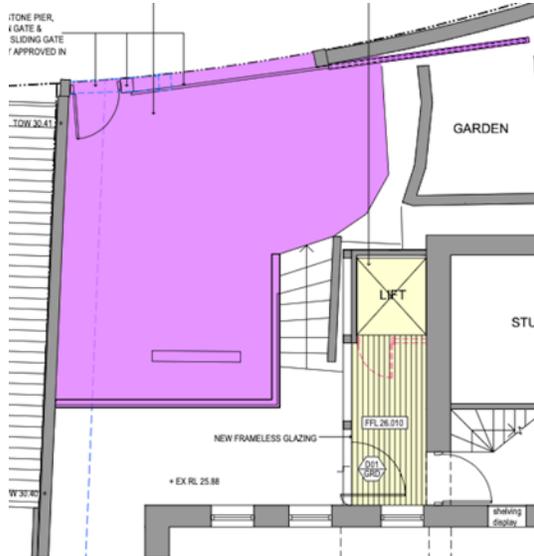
, Proposed ground level lift access, Michael Cumming Architect, 24.02.23
